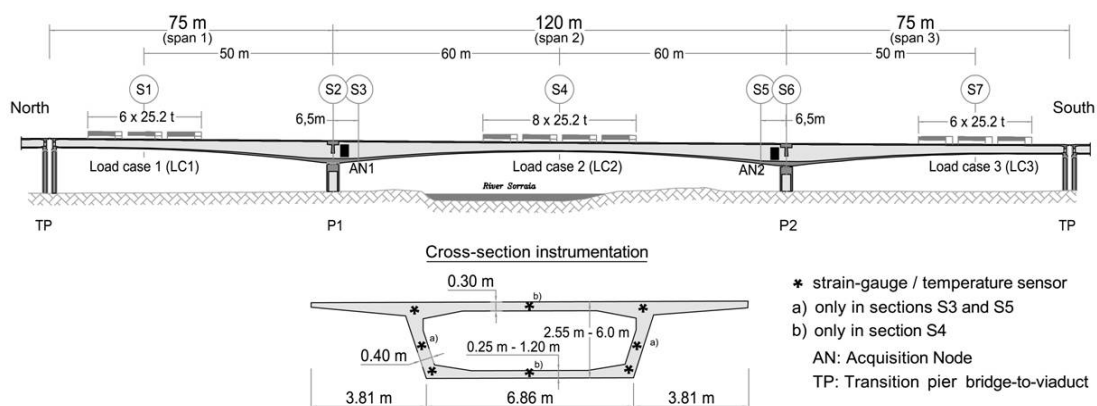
Location of the instrumented cross-sections in Sorraia Bridge
